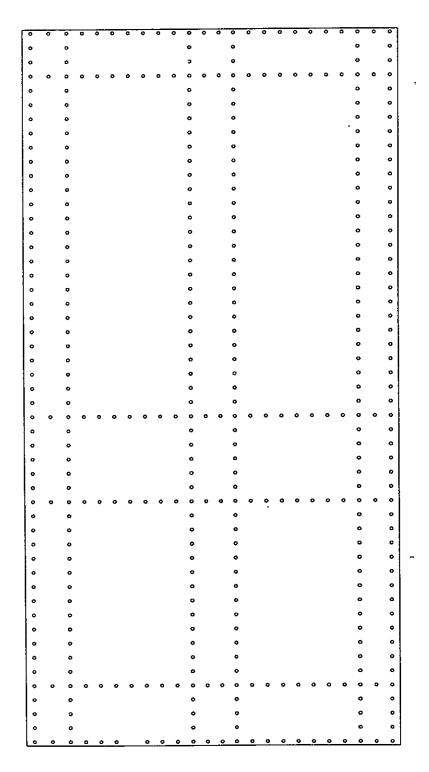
Elevation of the north side of the baize door, showing a pattern of nails relating to a four panel door design, apparently applied after the door was enlarged
